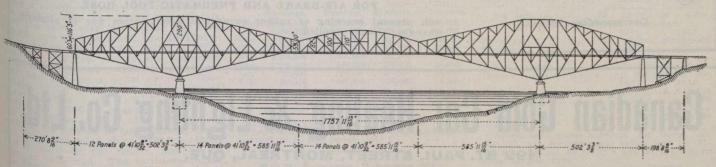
Unaccepted design A-B-X, of St. Lawrence Bridge Co., for Quebec bridge.
